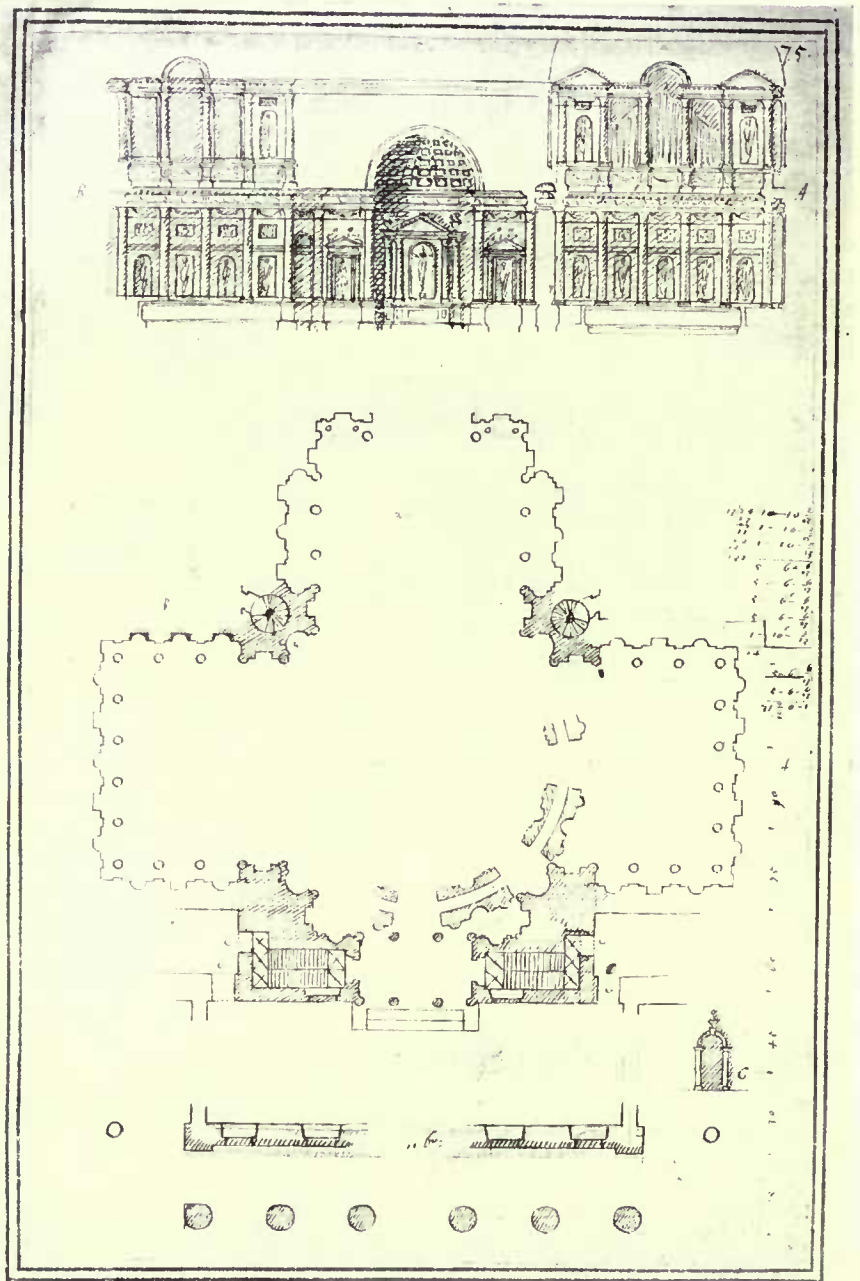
PLAN AND SECTION OF THE CHAPEL OR HALL ON THE PLAN SHOWN IN FIG. 28 (ON THE LOWER SIDE OF THE CENTRAL COURT) BY WEBB
